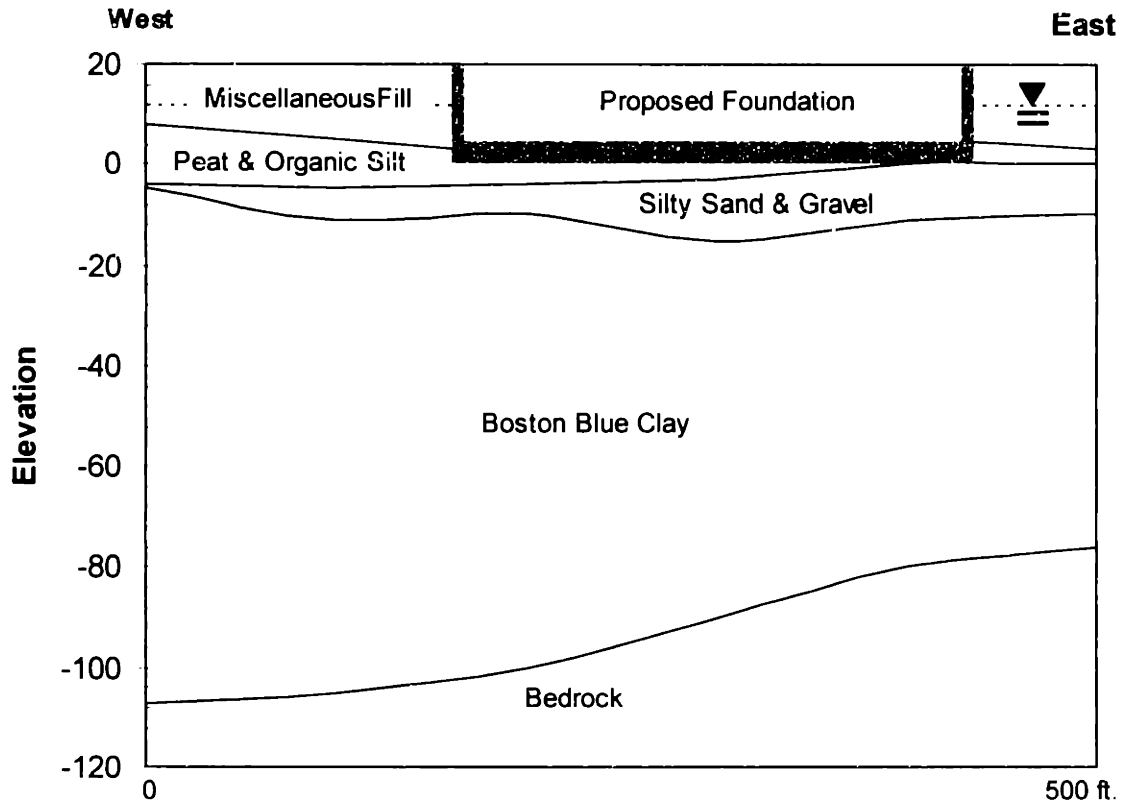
Stratigraphy of Building 48 site – profile along Vassar Street (Haley & Aldrich, 1967).
